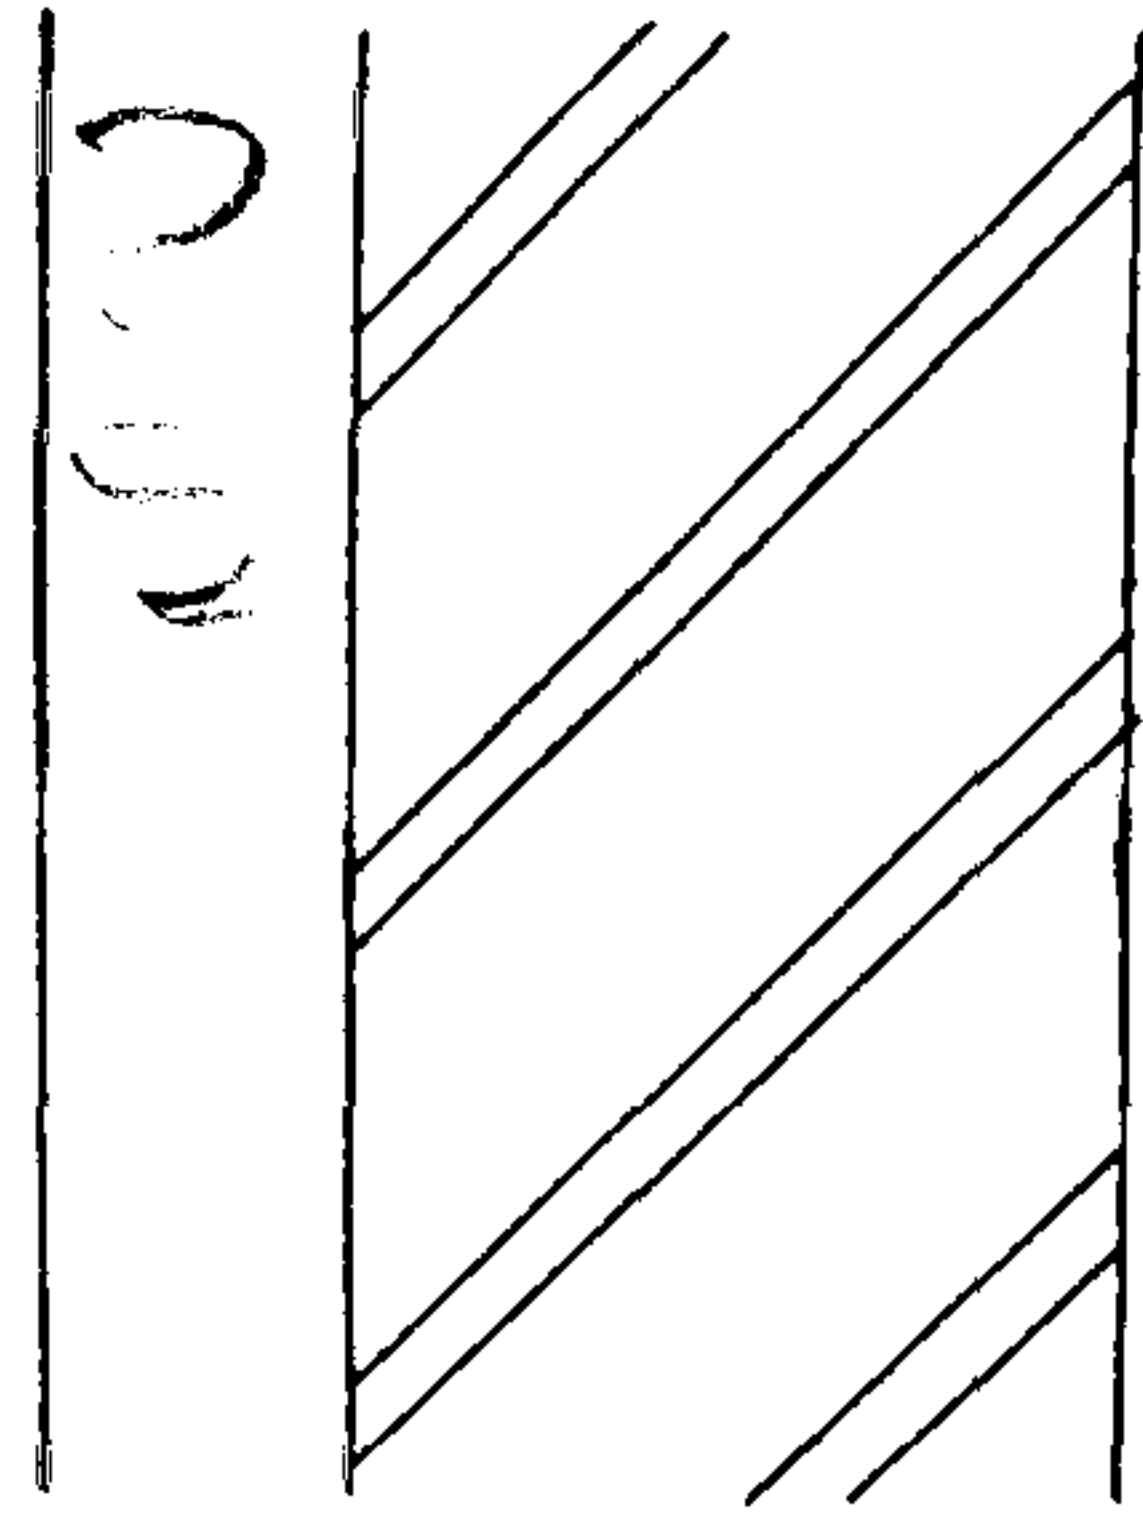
SOLID BRICK WALL, OUTSIDE INSULATION
